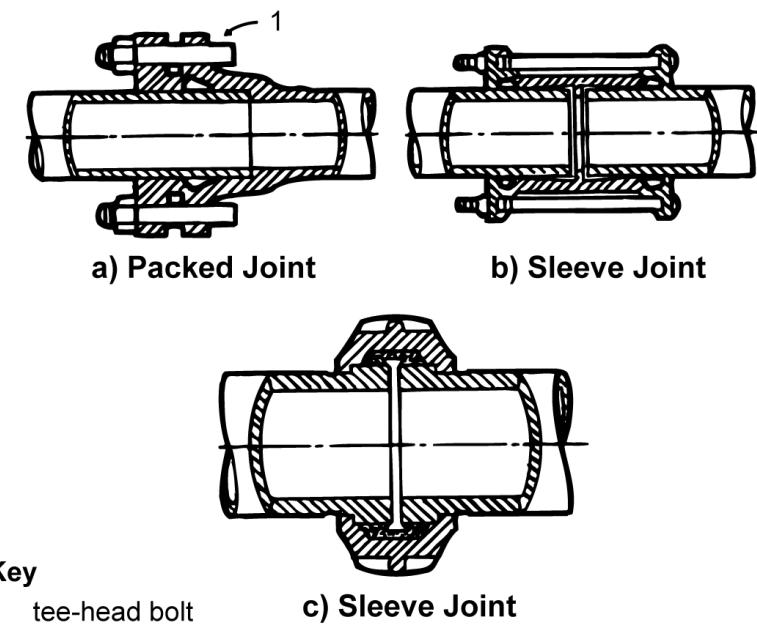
Cross Sections of Typical Packed and Sleeve Joints
